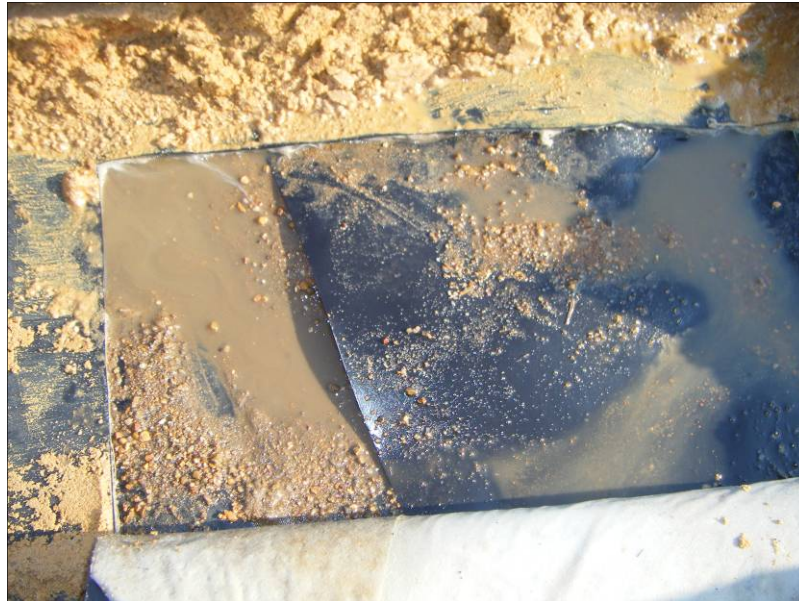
Exide facility storm water detention pond on the morning of September 19, 2009. Photo taken facing north-west.
